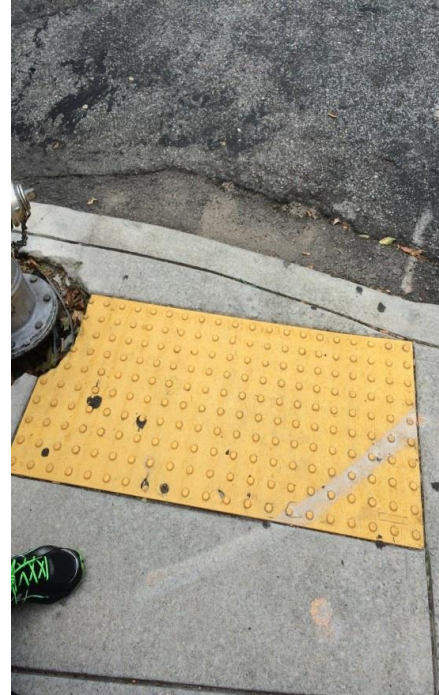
South-facing wheelchair ramp at the NE corner of intersection John Portman Boulevard and Courtland Street NE (same block as Atlanta Hilton). The uneven connection to ramp from street poses issues for wheelchair users. The ramp is also partially blocked by fire hydrant.
